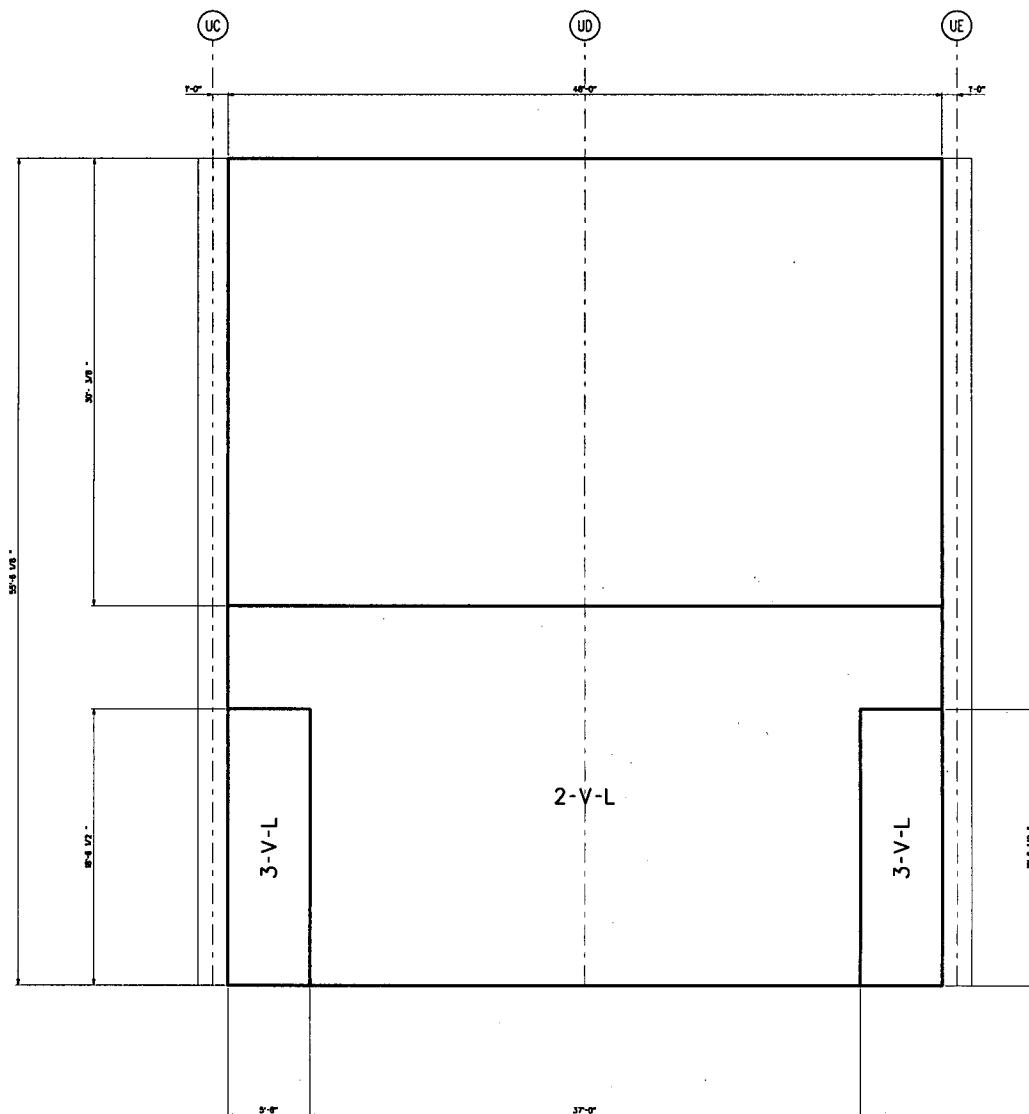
H.6-11B: FAN WEST WALL LOOKING EAST
